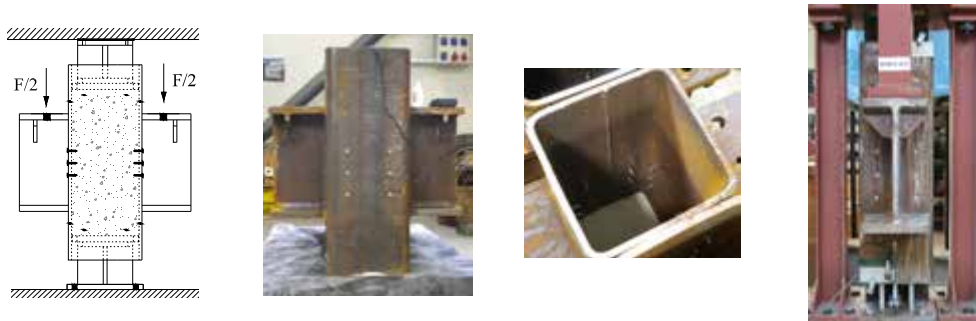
Figure XI. Load introduction tests: steel-concrete connection with shot fired nails (Univ. of Timisoara)
